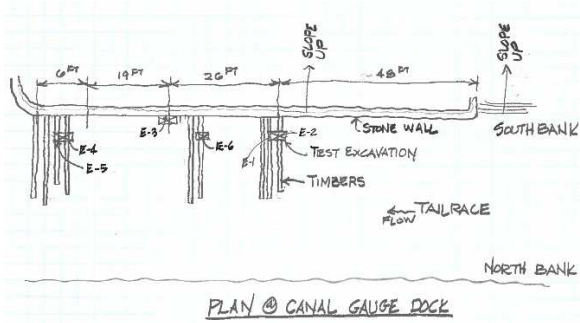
Field Sketch - Plan of the Dock Excavation with locations of timbers and test pits
